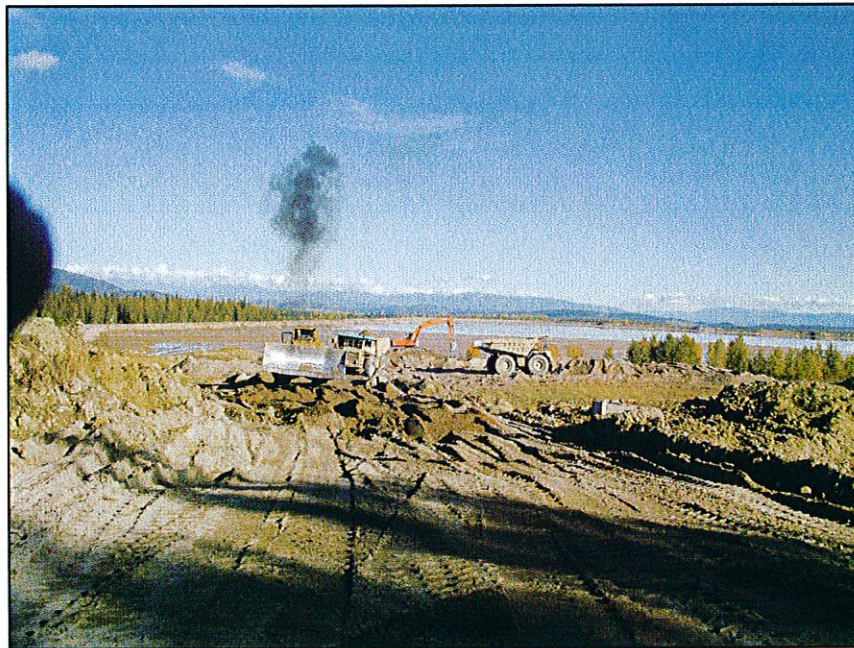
Sand cell on the Perimeter Embankment. Tailings are discharged at the far end and exit into the TSF through culverts installed at the opposite end of the cell.
